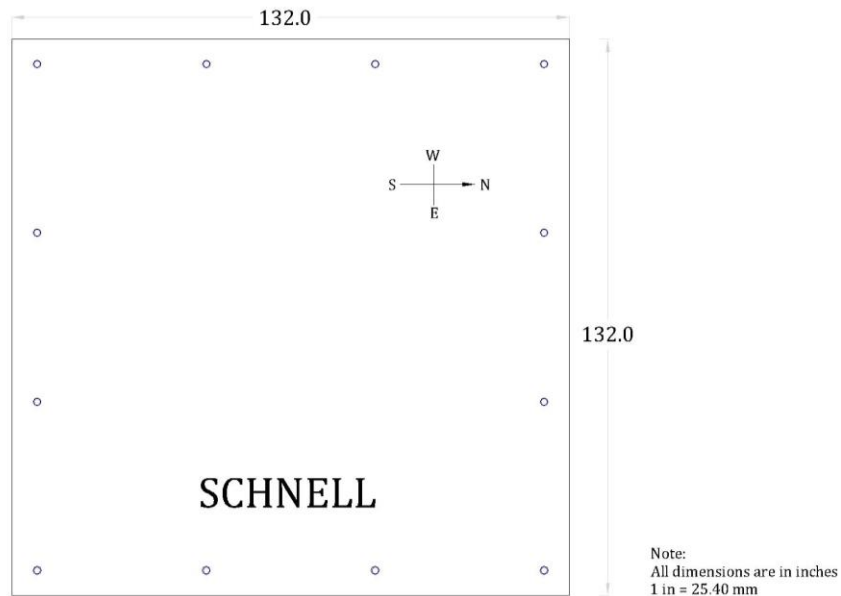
Layout of Sandwich Slab Specimens A and B
